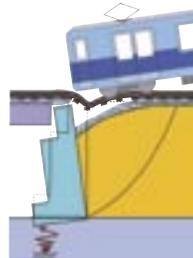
Image of the damaged bridge abutment at earthquake.
